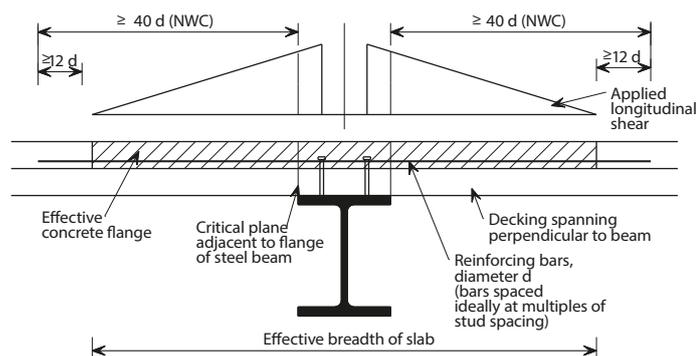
Assumed pattern of transverse shear stresses and anchorage lengths, beam with transverse decking
